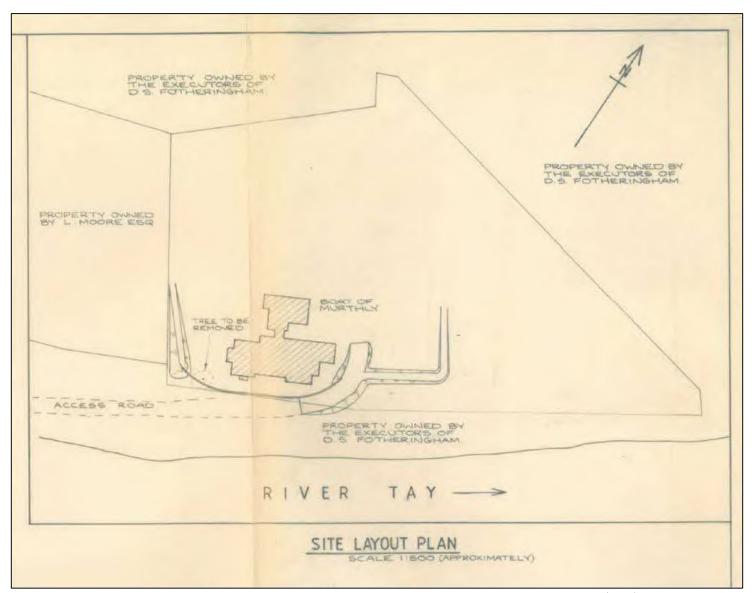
Excerpt from original design drawing of flood wall by Allen Gordon Consulting Engineers (2 of 5)
